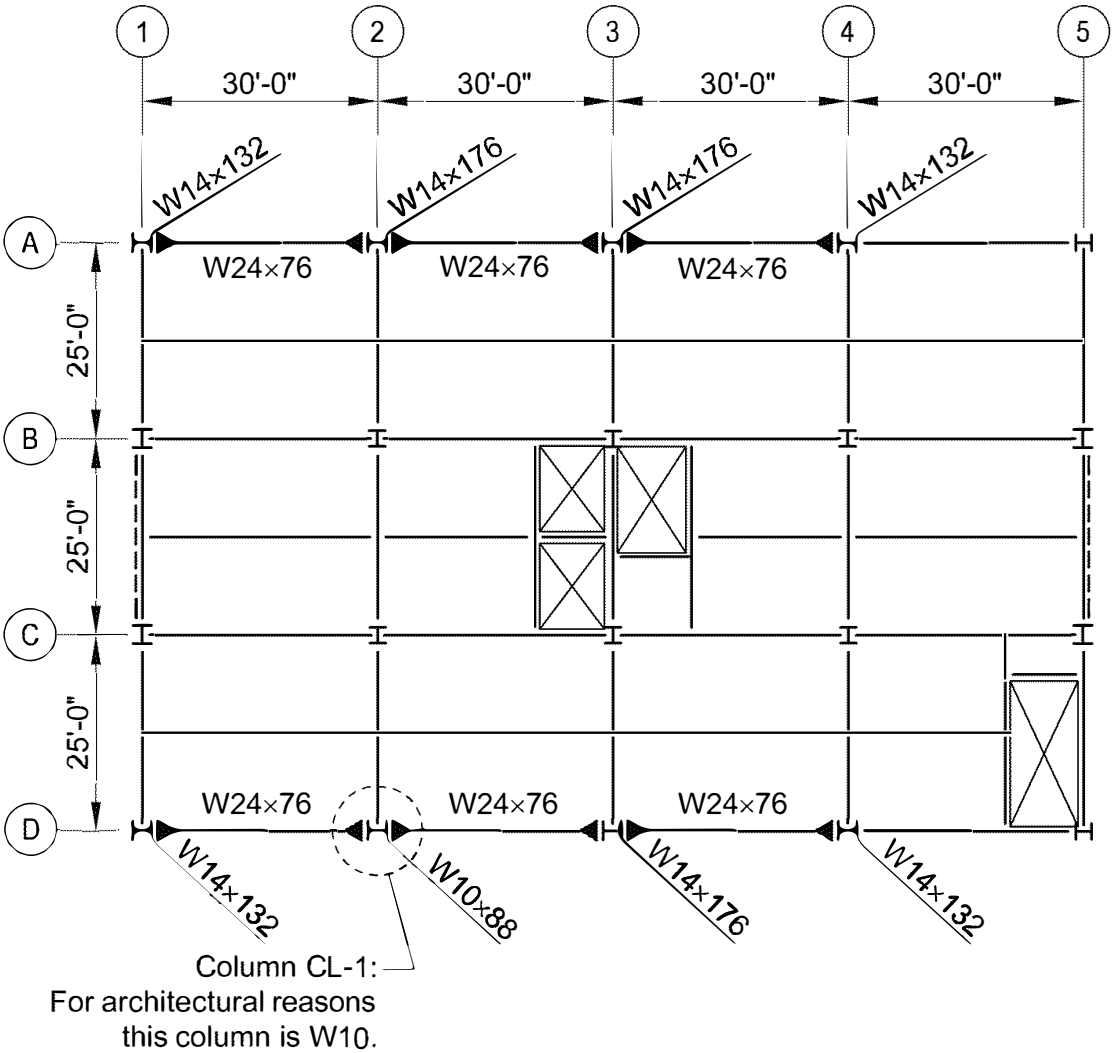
Plan view of the second level for strong-column weak-beam Exception example.
